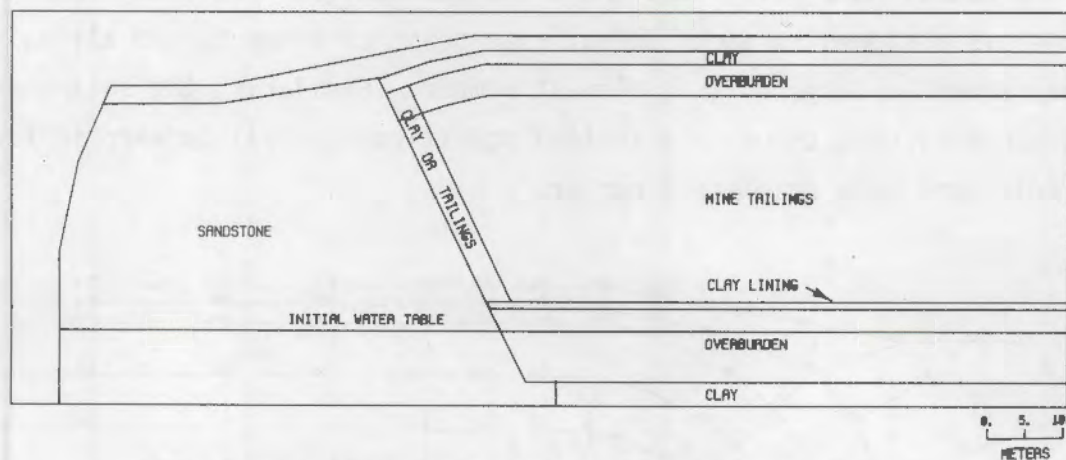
Schematic Diagram of Half of the Typical Tailings Burial Pit
